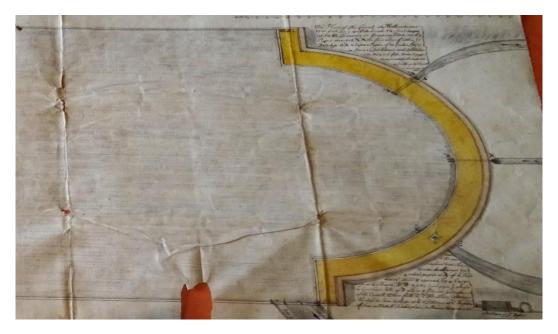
The Engineer's canal plan, 1724. Mellerstain House Trust.
